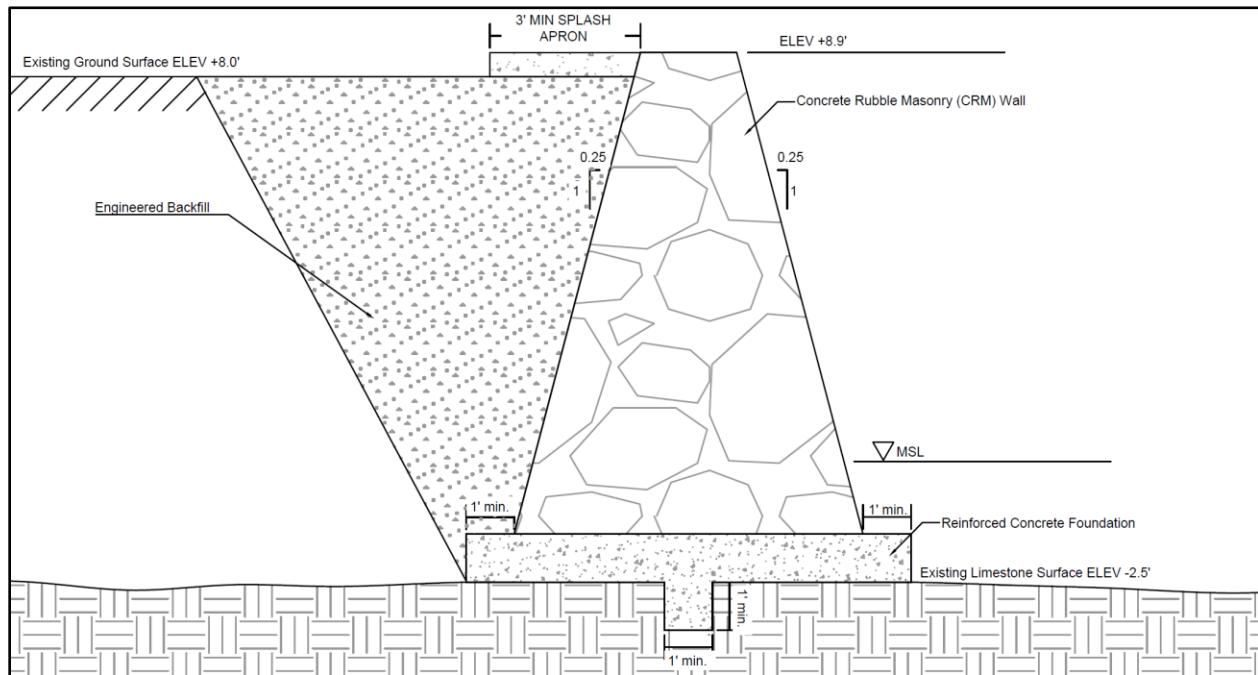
Typical surface of a Concrete Rubble Masonry Wall
